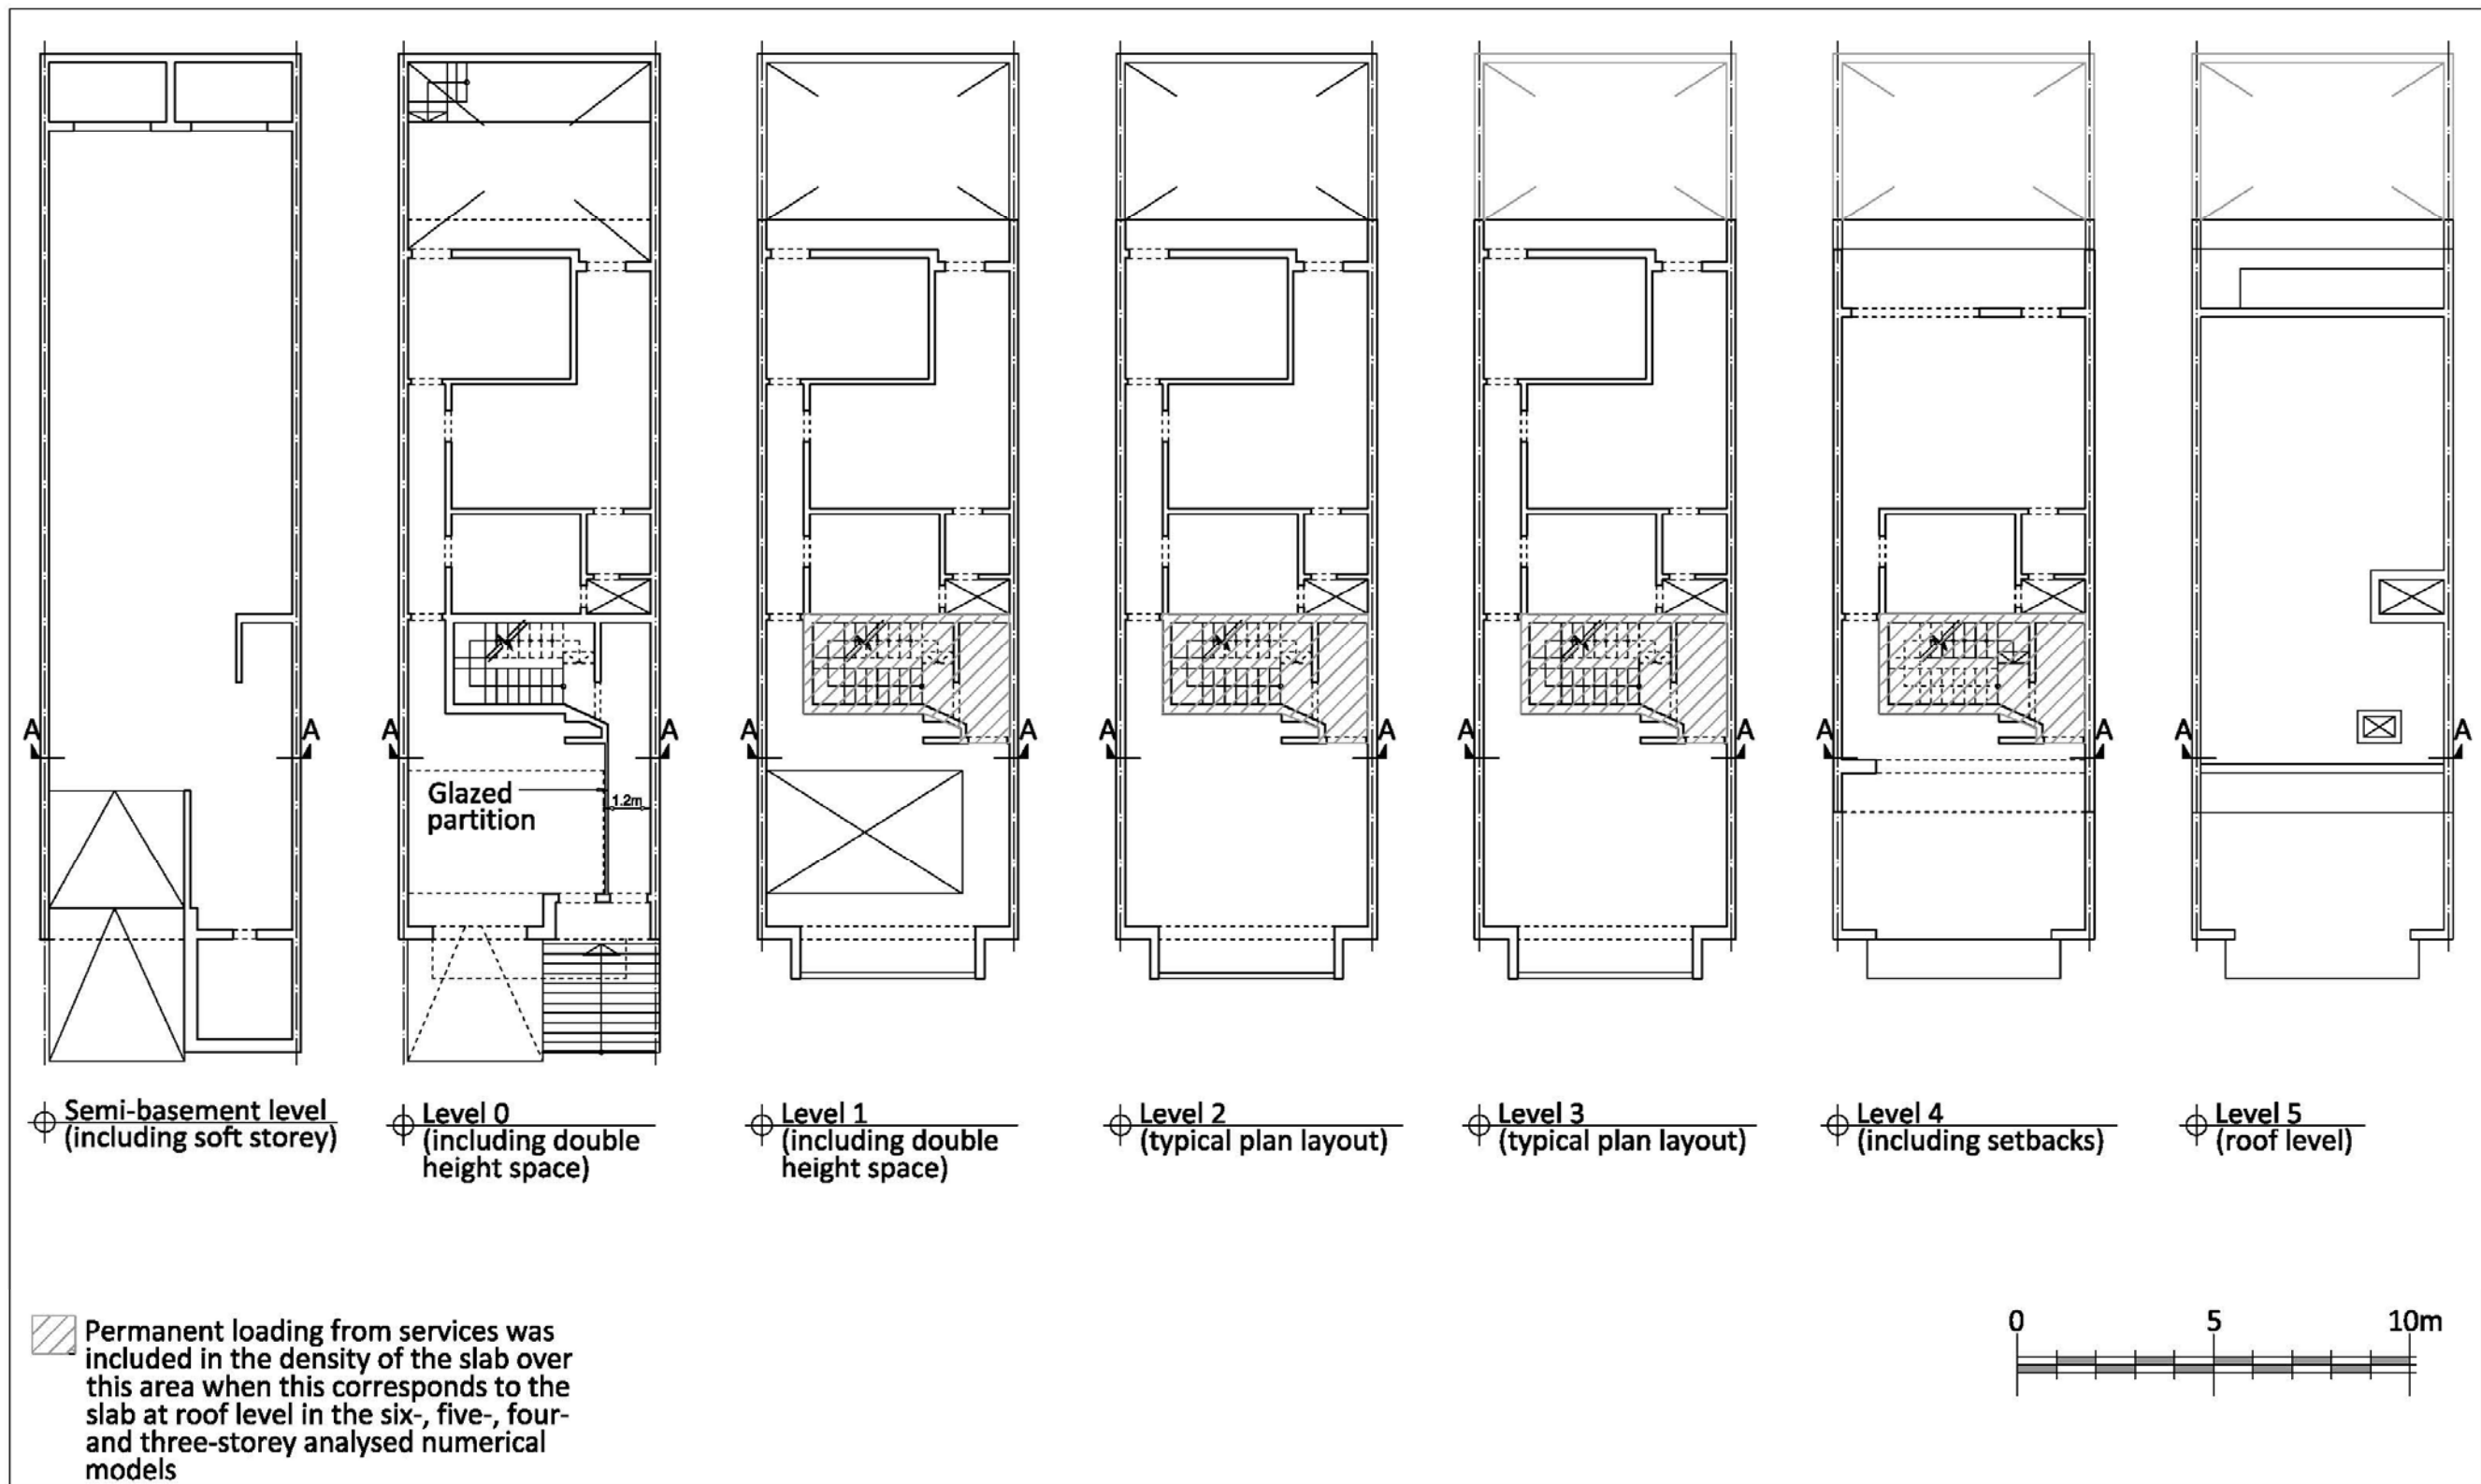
Plan layouts at all levels for analysed single building numerical models including a soft storey at semi-basement level, setbacks at penthouse level and a double height space between Levels 0 and 1 (plan length-to-width ratio 2.75:1).
